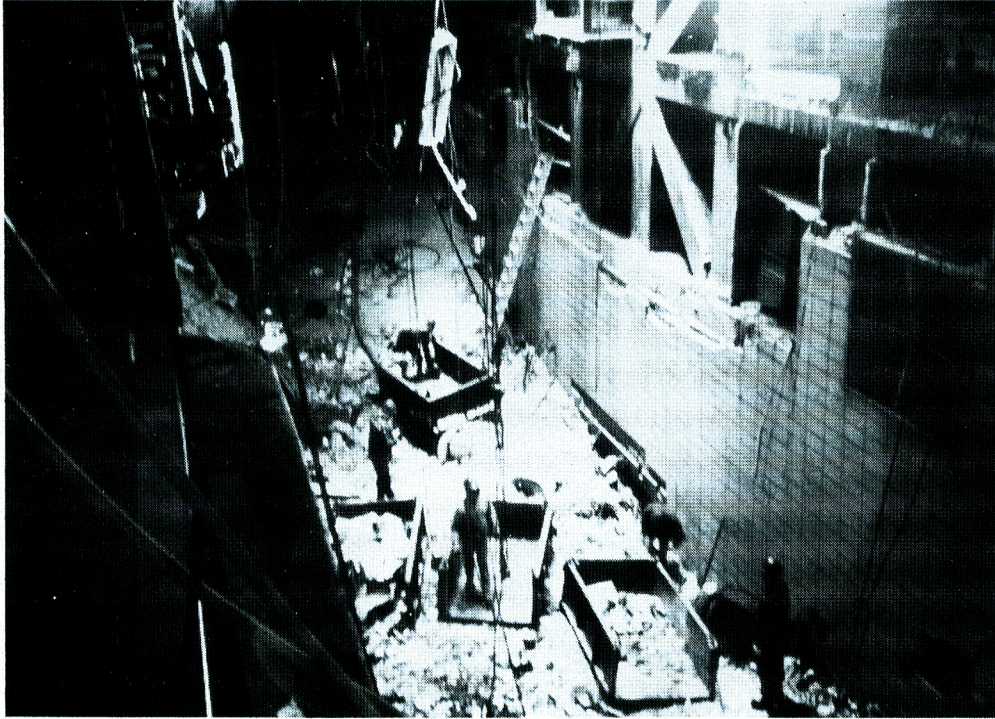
Site of explosion, looking toward the south wall of Tower 1. Notice the missing top-left diagonal brace.
